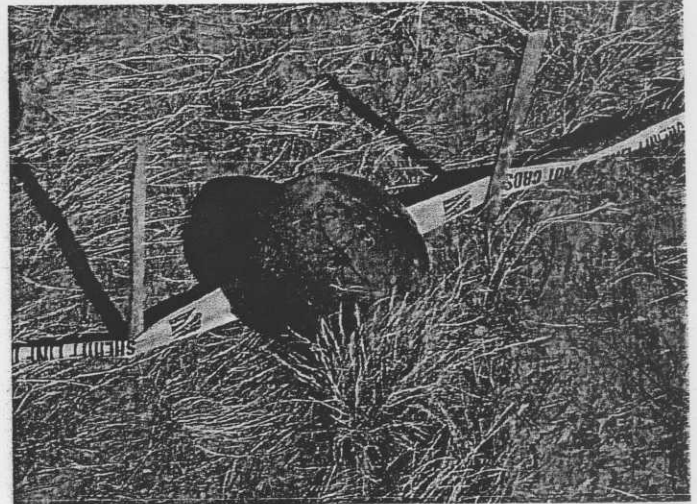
This pig was located some 735' from the ruptured pipeline. The glycol fill port was damaged on this pig. It was somewhat east and a bit further south of the pig in Photo #13.
